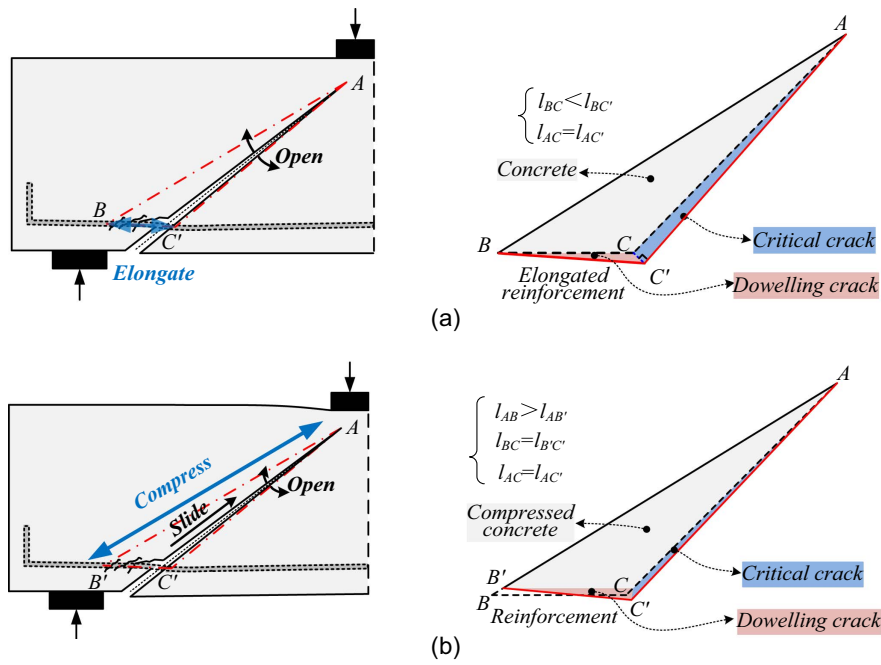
Formation of crack opening and sliding: (a) crack opening due to rebar elongation; and (b) crack opening and sliding due to concrete compression.
